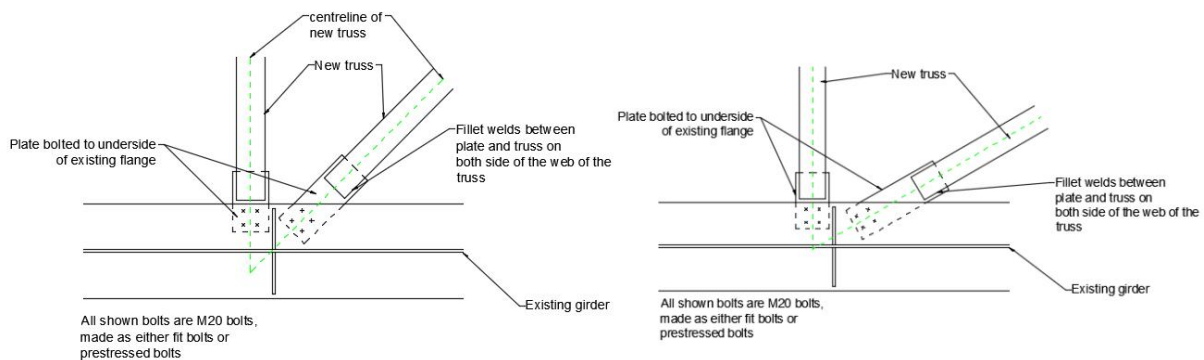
The third solution for the connection between the K-shaped truss system and the bottom flange of the existing girder
